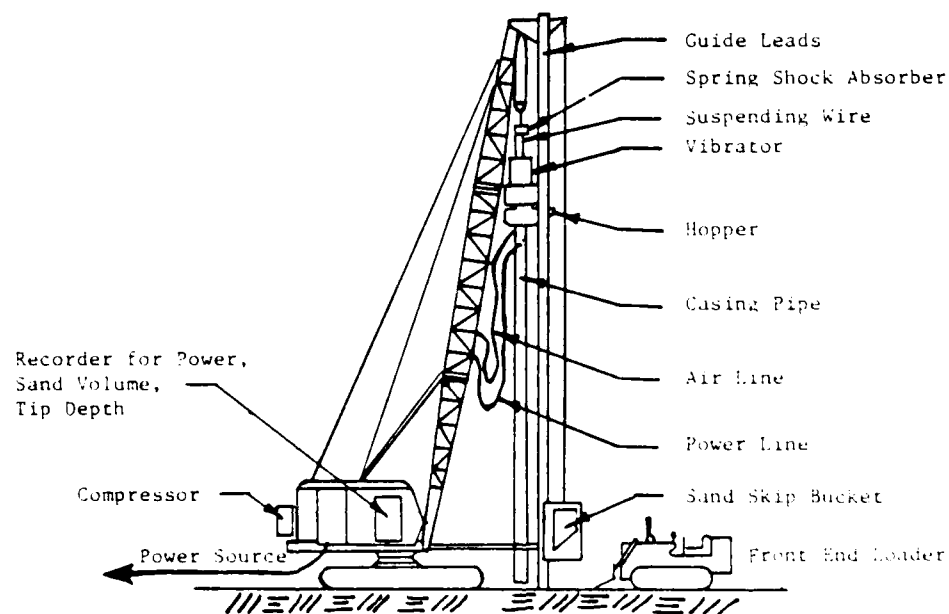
Typical equipment used to construct a sand compaction pile in Japan (after Tanimoto, 1973)
